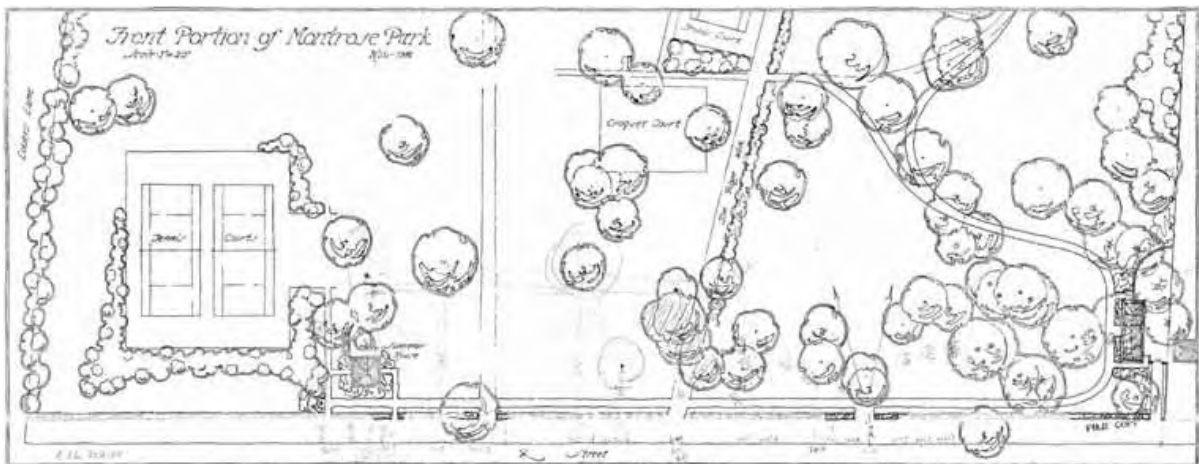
Amended site plan showing Lodge building. (NPS/NCR, Prints and Drawing Collection #891/80030, 5 of 5).
